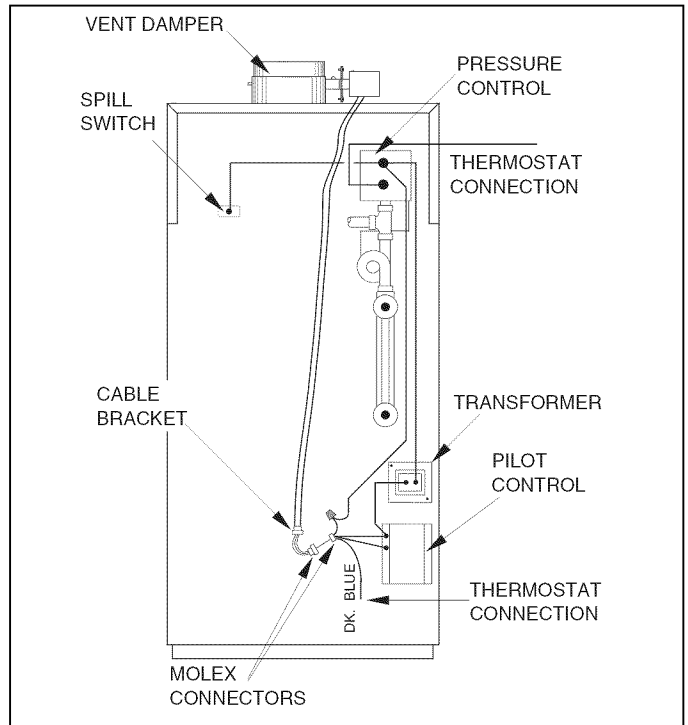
VENT DAMPER INSTALLATION FOR INTERMITTENT PILOT
